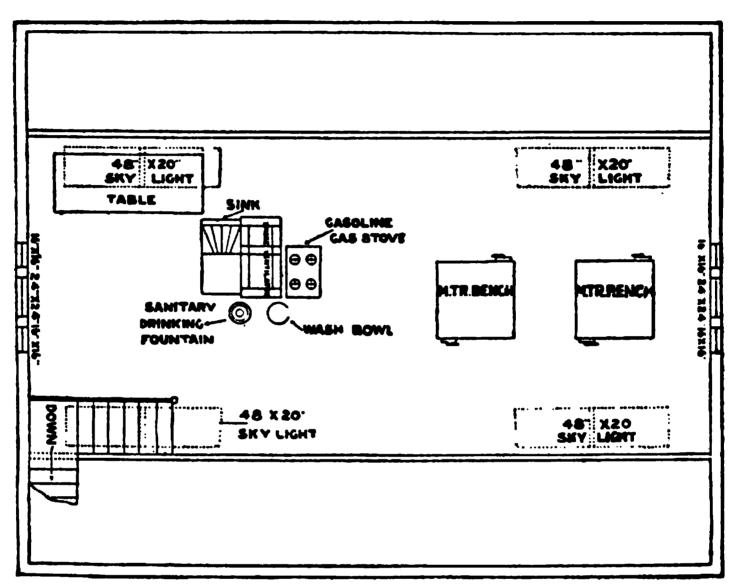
Attic plan, model rural school, Kirksville, Mo.
